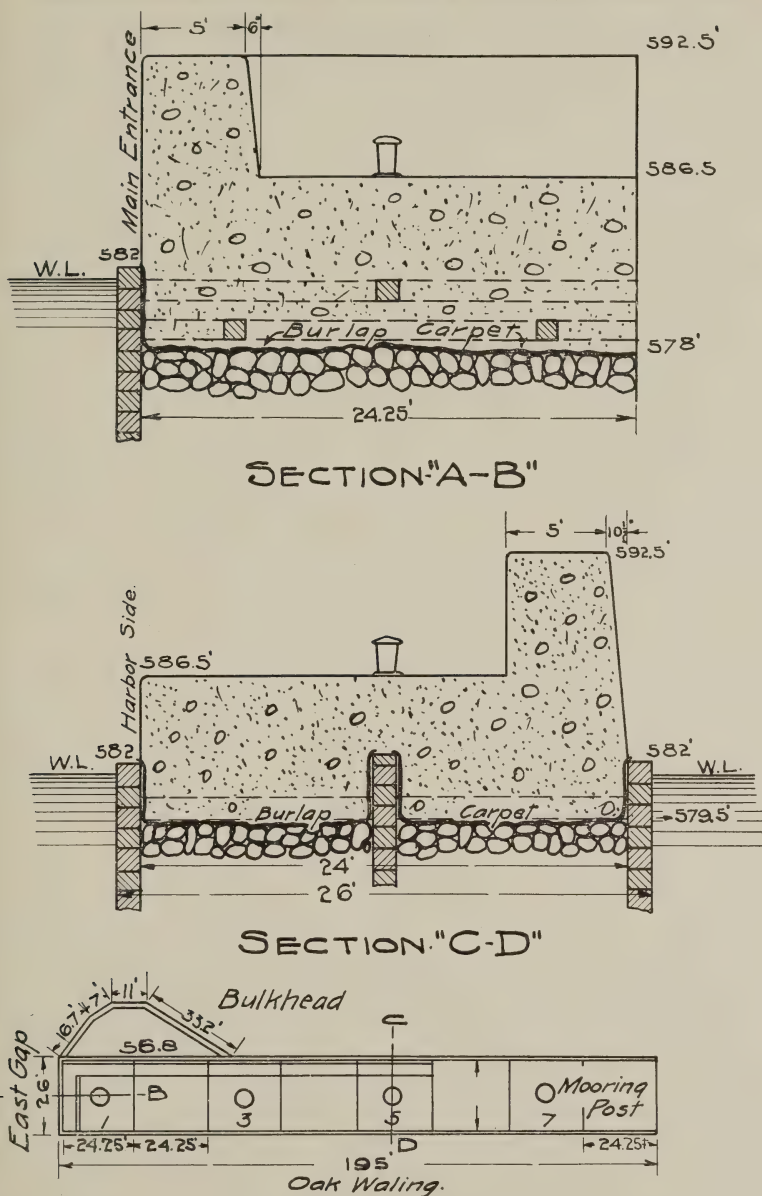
Plan and enlarged cross section of concrete superstructure for the pierhead, South Pier, Harbor Beach, Michigan.
